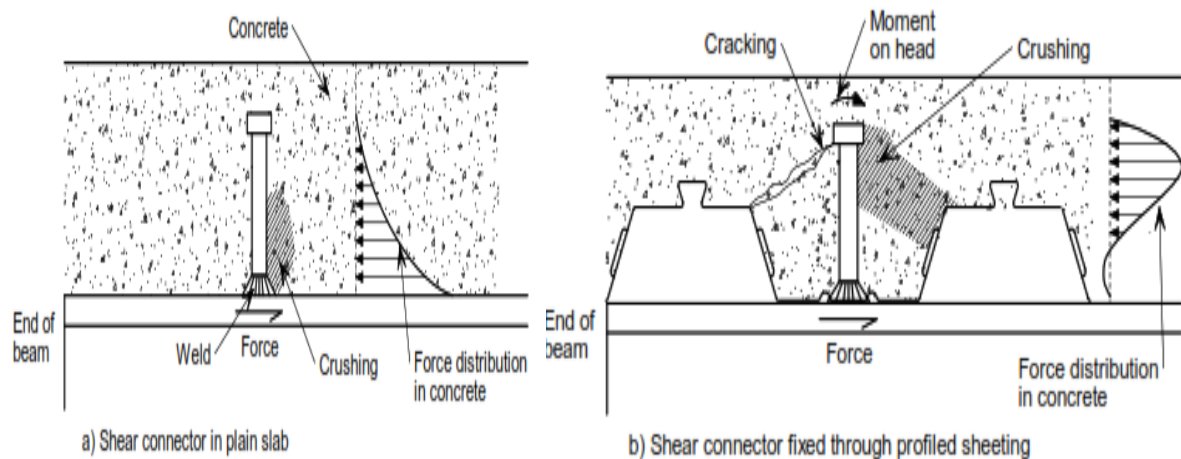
Shear connectors connected to secondary beams (a) and to primary beams(b)
